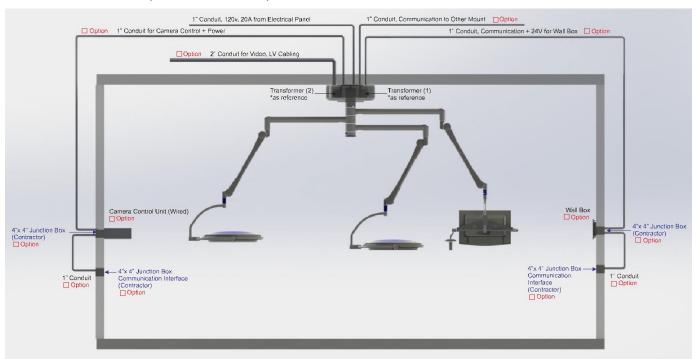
Alternate Mount (Electronics on Tube) Conduit Plan, Elevation View
